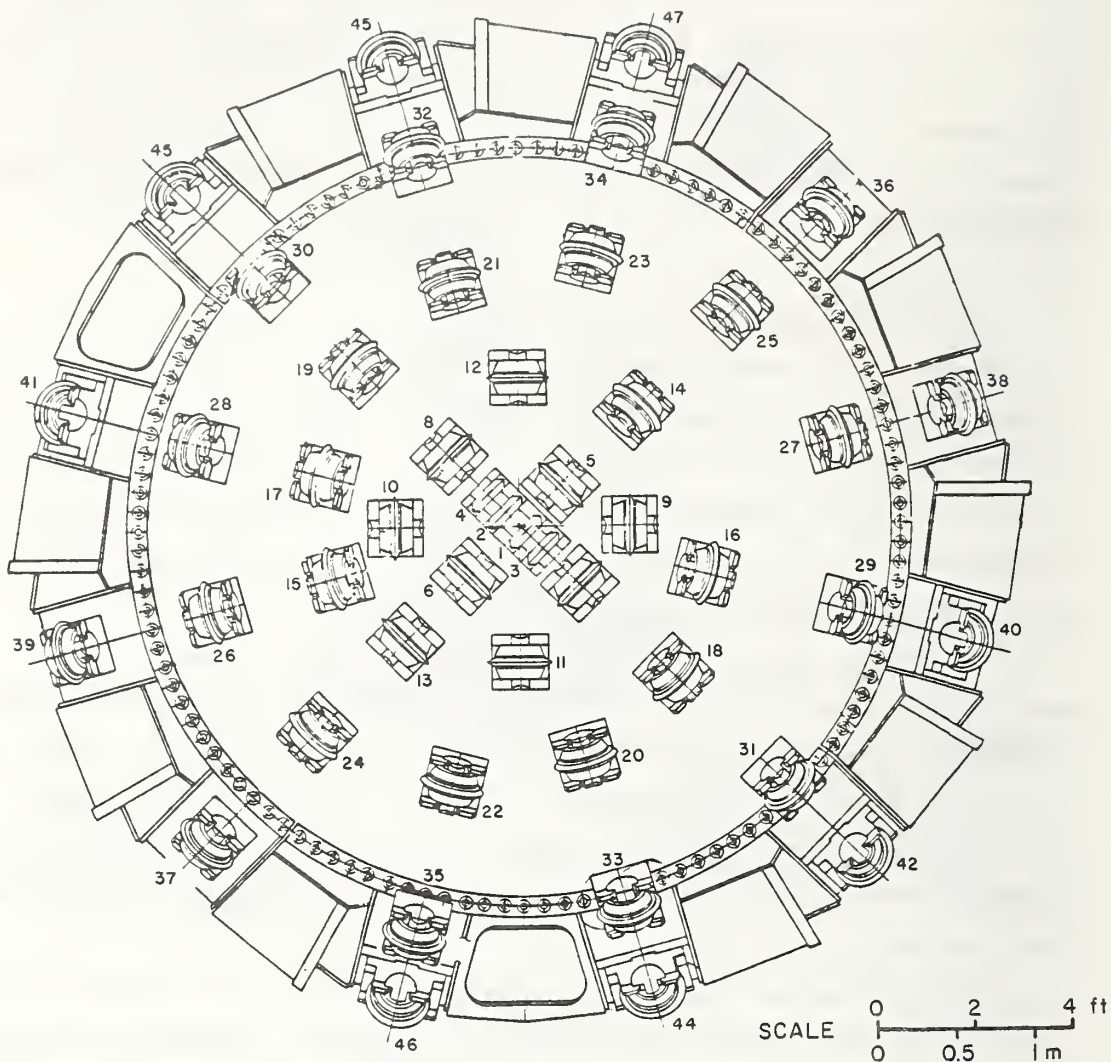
VIEW OF THE CUTTERHEAD FACE OF THE TARP CONTRACT
